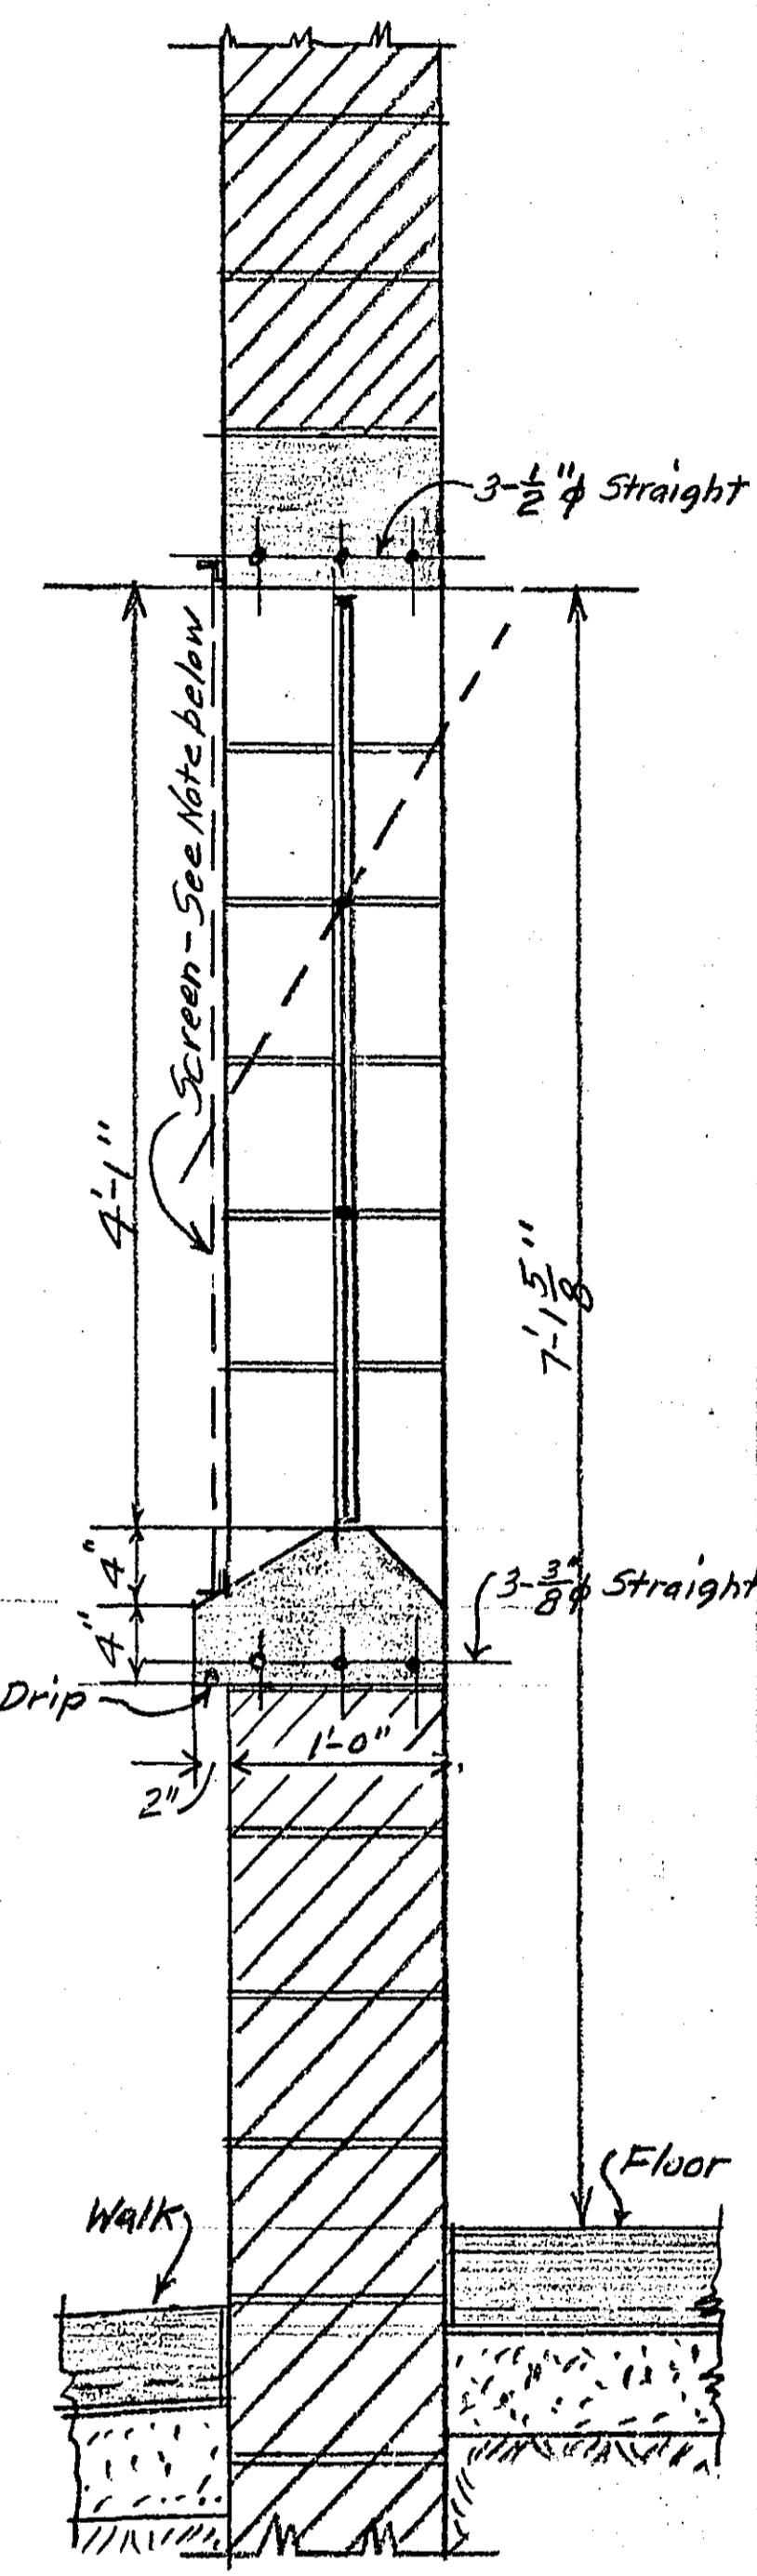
DETAIL OF SERVICE WINDOW OPENINGS - 3 THUS - SCALE NOTED
